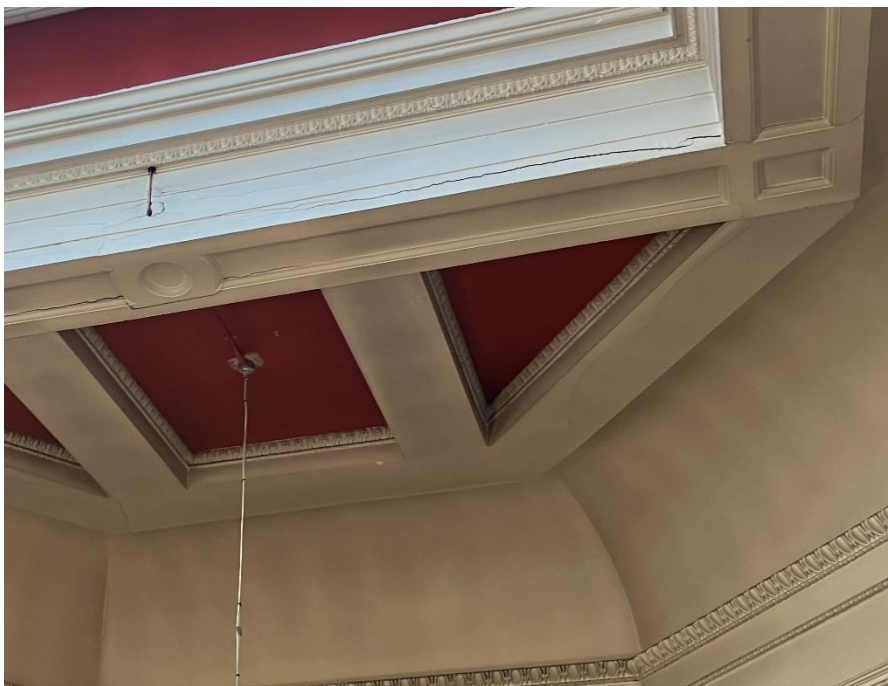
Main library – example of failed and detached ceiling plaster
